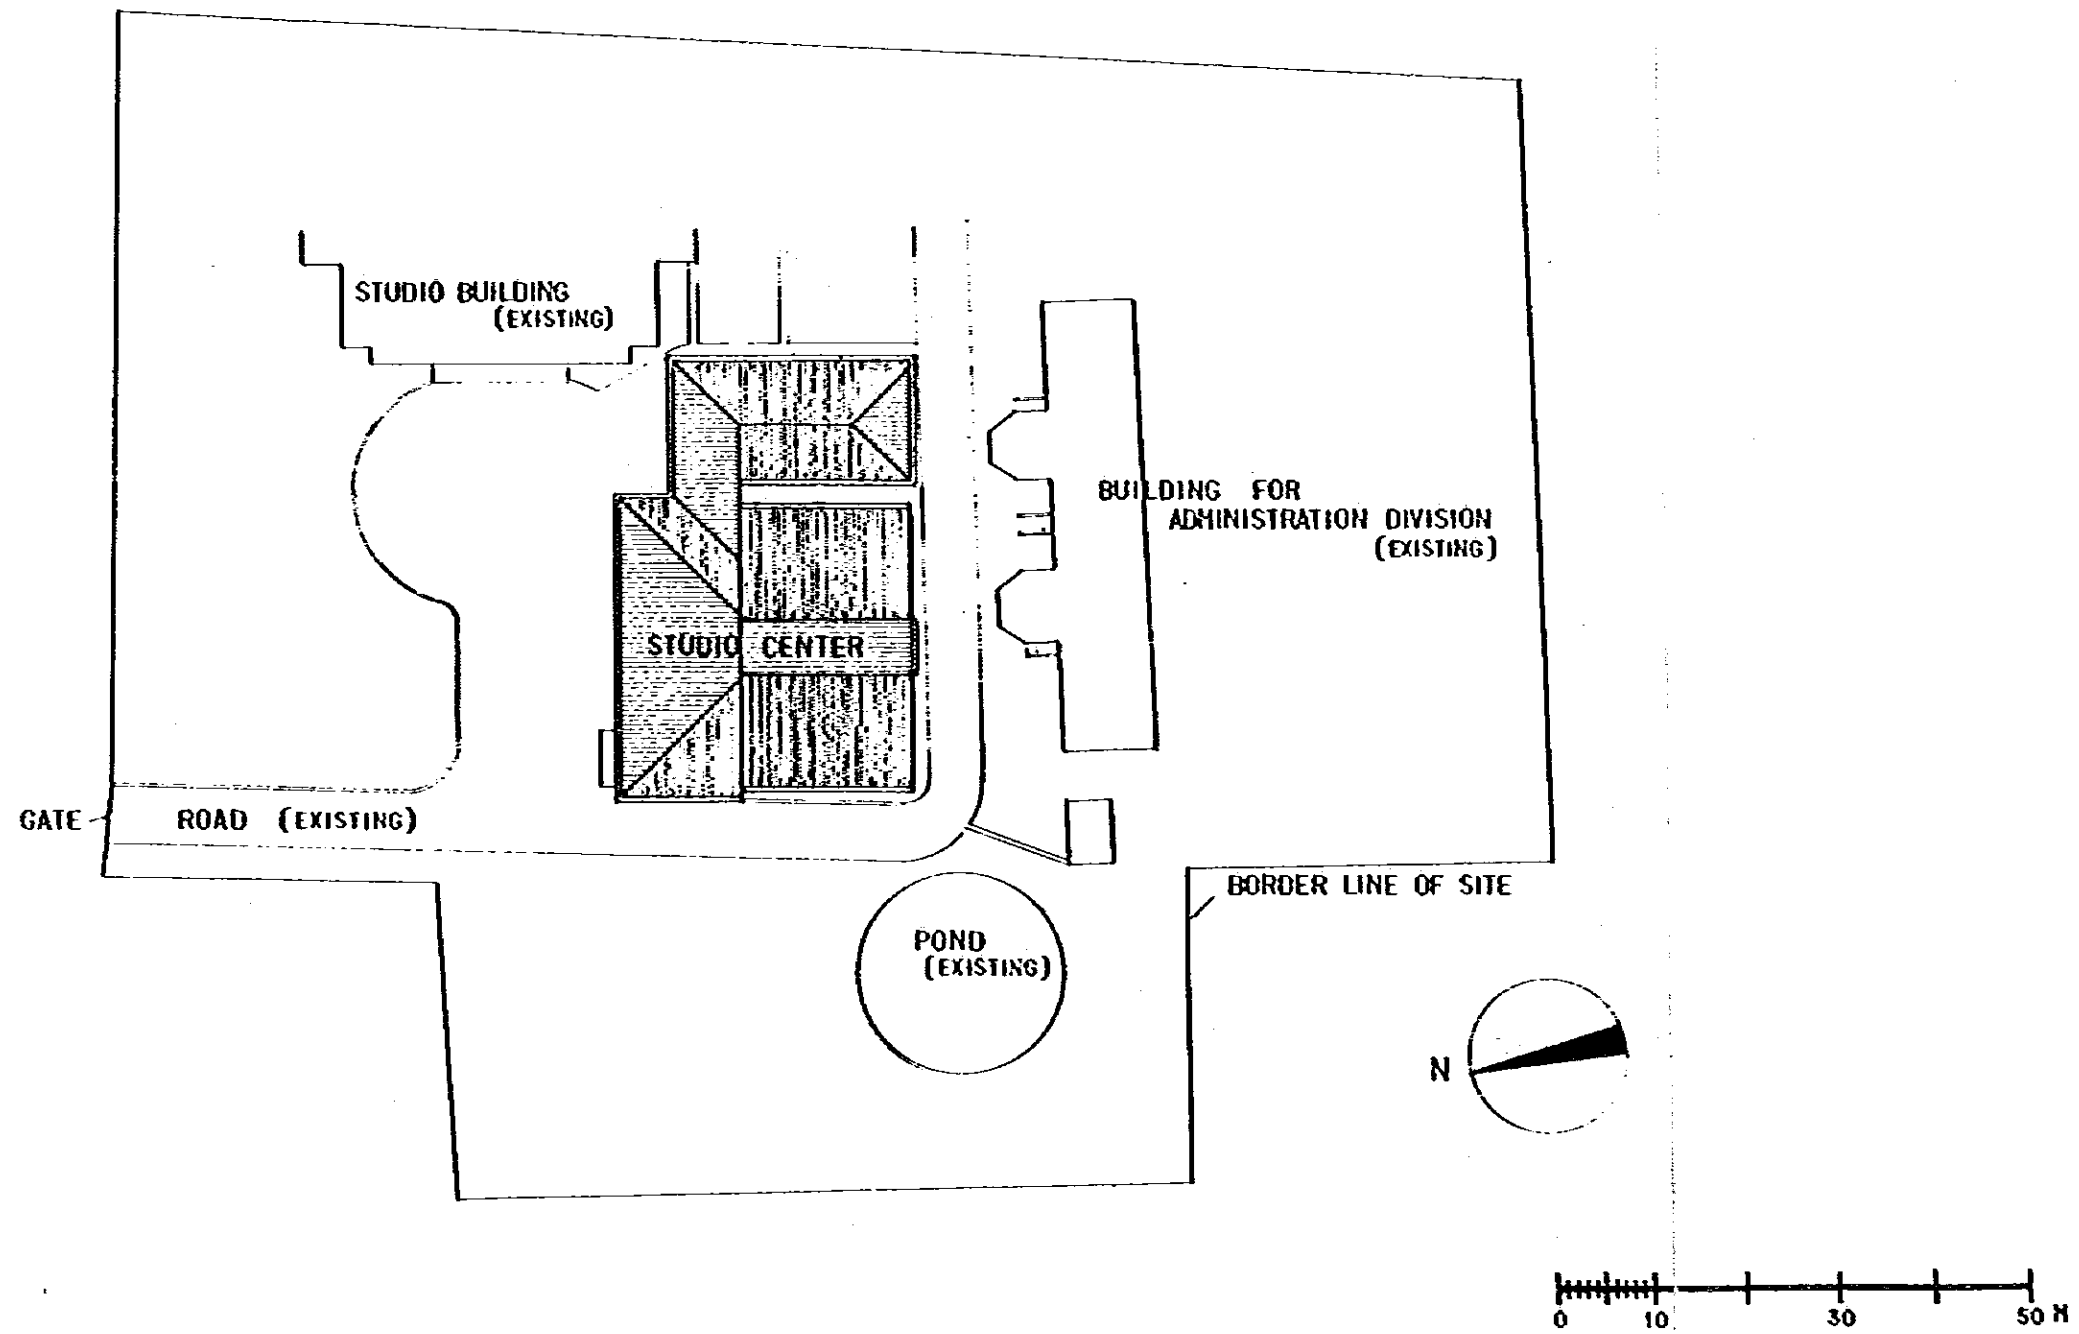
SITE PLAN — KATHMANDU STUDIO CENTER
